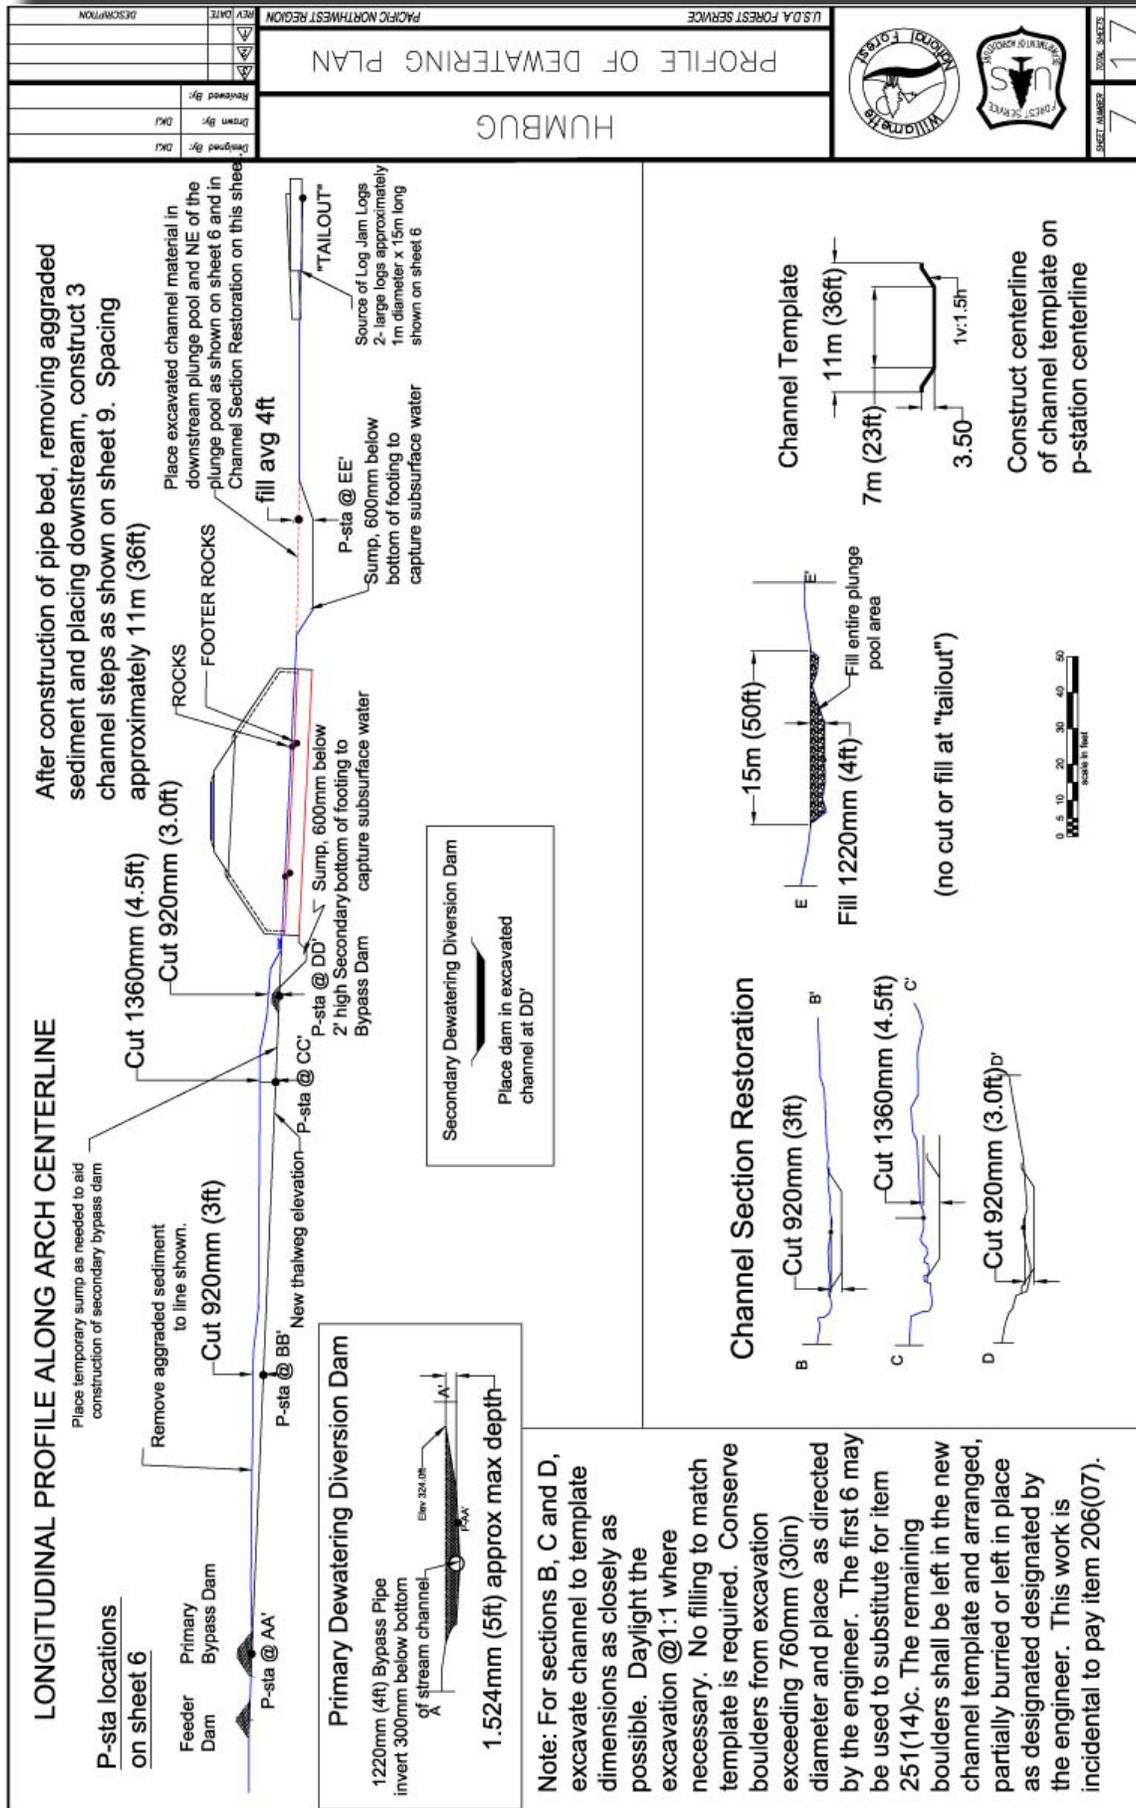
Humbug West Sheet 7 - Profile of Dewatering Plan.
